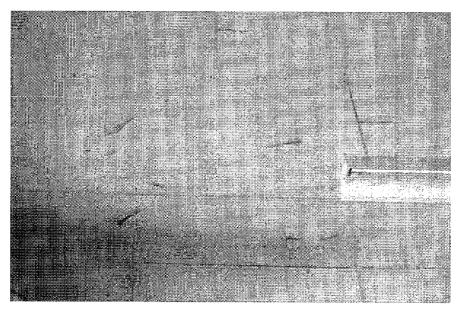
Blue paint with elevated levels of lead on the ceiling of the northern room of the commercial tenancy at 91 Liverpool Road.
